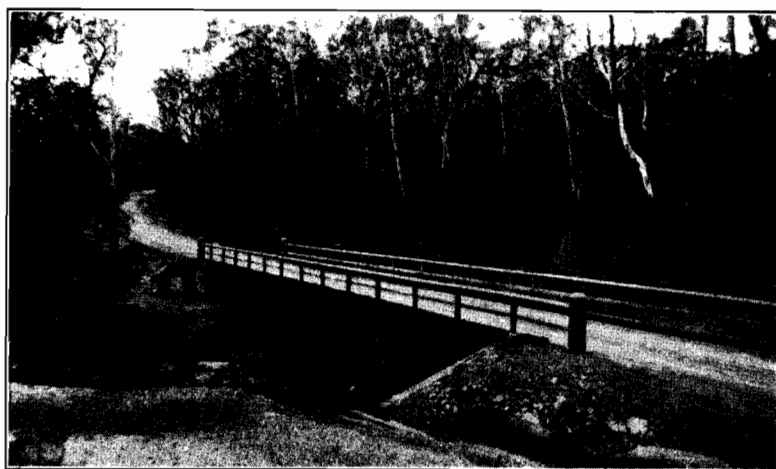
New Bridge erected on the Grampians Road over the Fyan's Creek.
